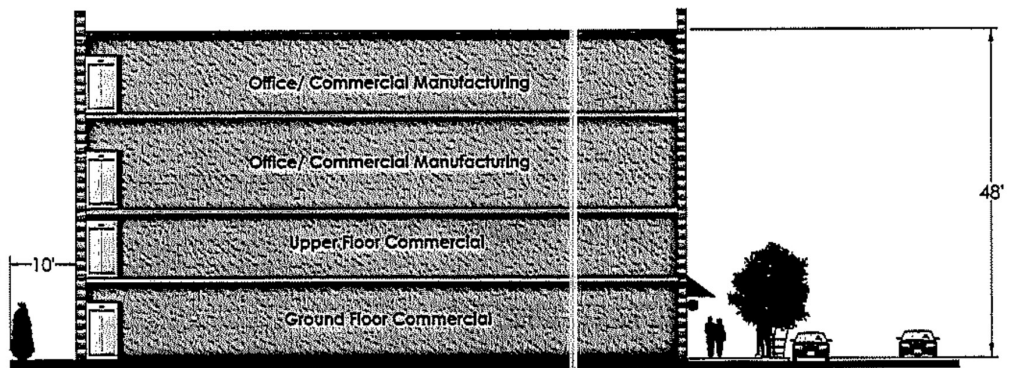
Illustrative section view of a 4-story building with multiple non-residential uses.
